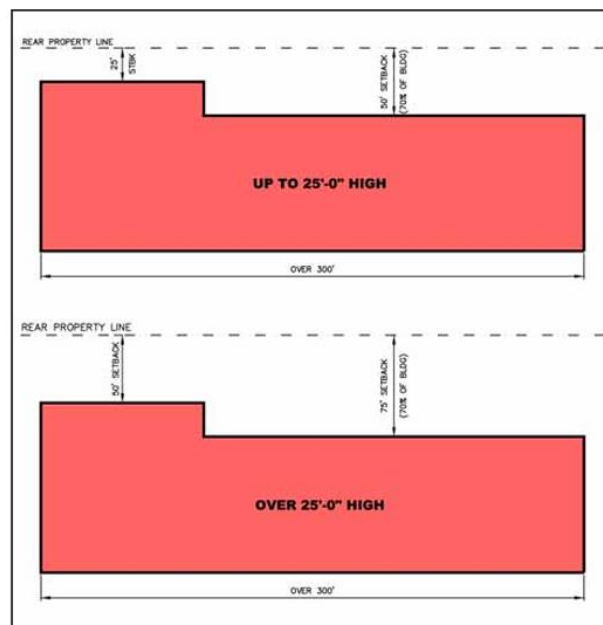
Setbacks for Buildings over 300' wide on East side of Federal Highway
